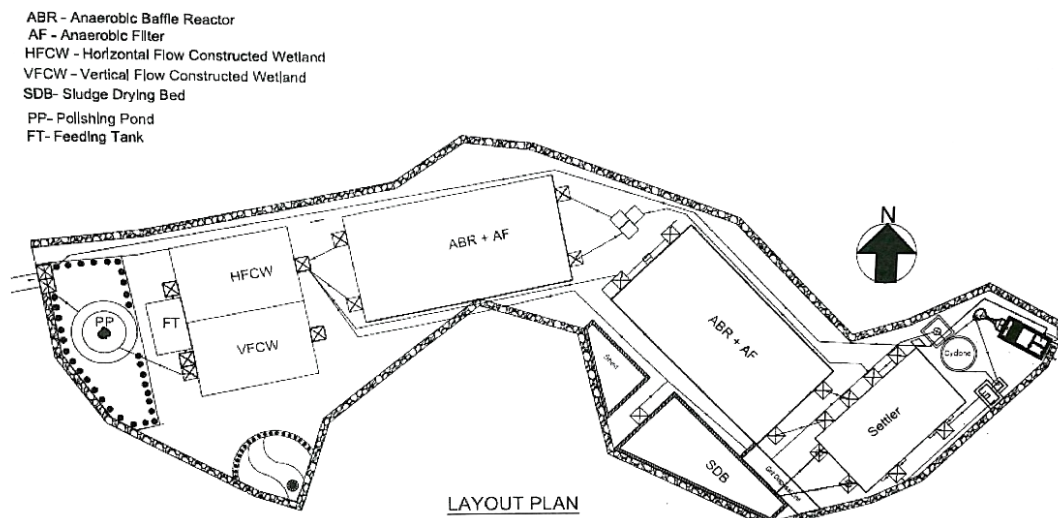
Layout plan of the Constructed Wetland System at Dhulikhel (Source: ENPHO, 2010)
